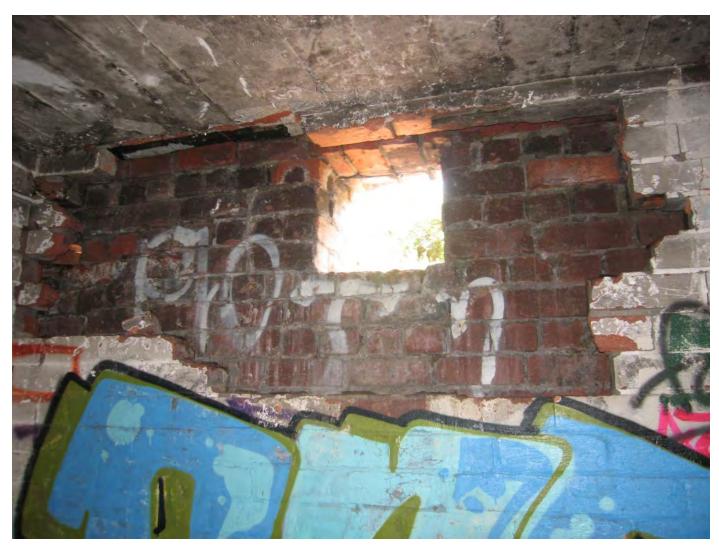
Operations Bunker – Small opening in north wall with damaged brickwork
